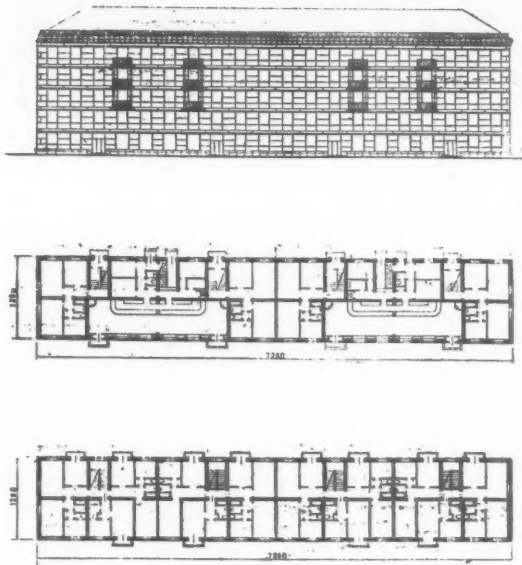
Typical floor plan, ground floor plan and elevation of standardized 5-storey housing in Kiev in the period since 1955. Lifts are not provided. Note the large shops on the ground floor. In future, the shops and communal facilities are being provided separately and construction will be highly mechanized but the elevations so far are pretty much the same (see Fig. 53).
